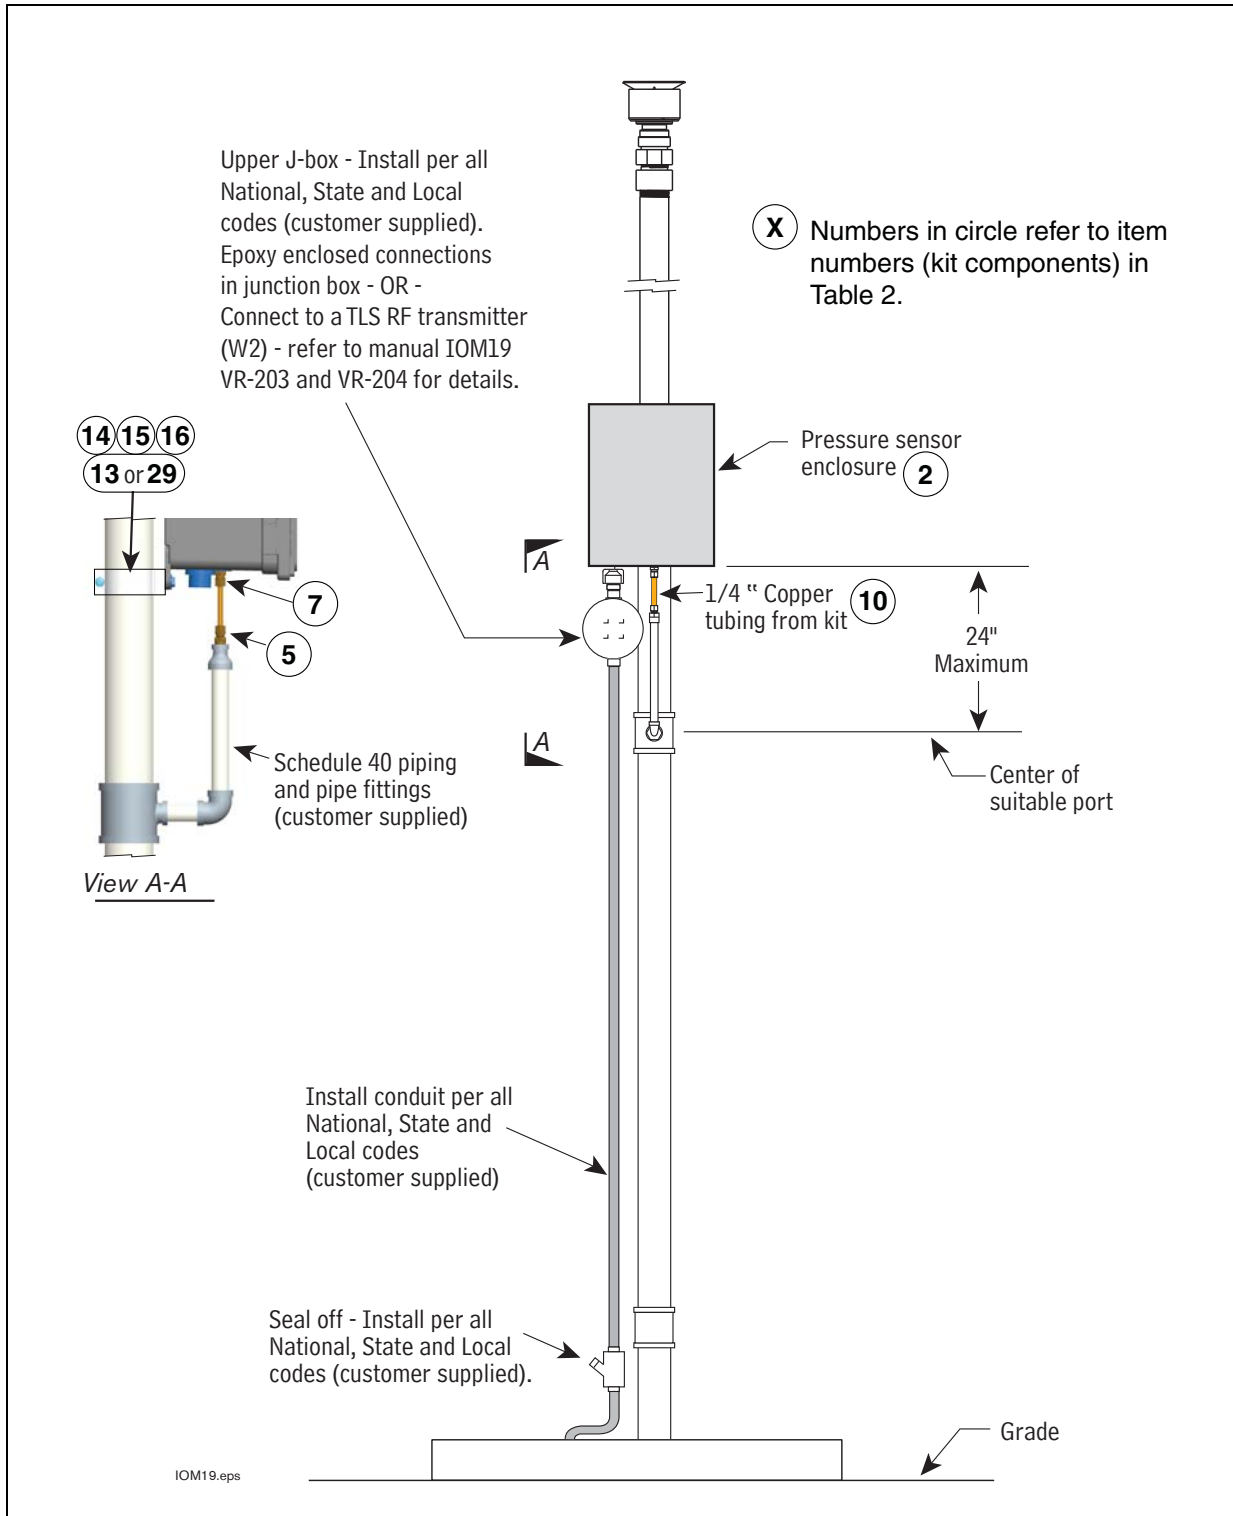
Locating Pressure Sensor Enclosure in Vapor Vent Stack
